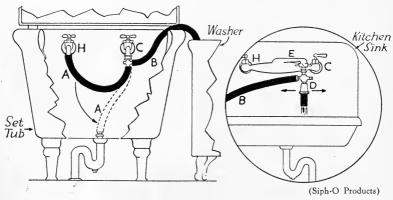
Hose connections for filling and emptying washing machine. "H" and "C" are hot and cold water faucets. Sketch at left shows hose in position to fill washer. When hose "A" is placed in position shown by dotted lines, the washing machine may be emptied. Hose "B" connects both faucets to the washer. Sketch at right shows a combination outlet "E" for both faucets. By turning valve at "D" the washer may either be filled or emptied
